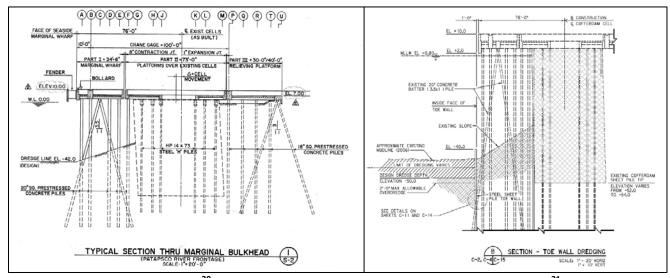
TYPICAL EXISTING ²⁰ CROSS AND PROPOSED SECTIONS AT SEAGIRT BERTH 3 ²¹
